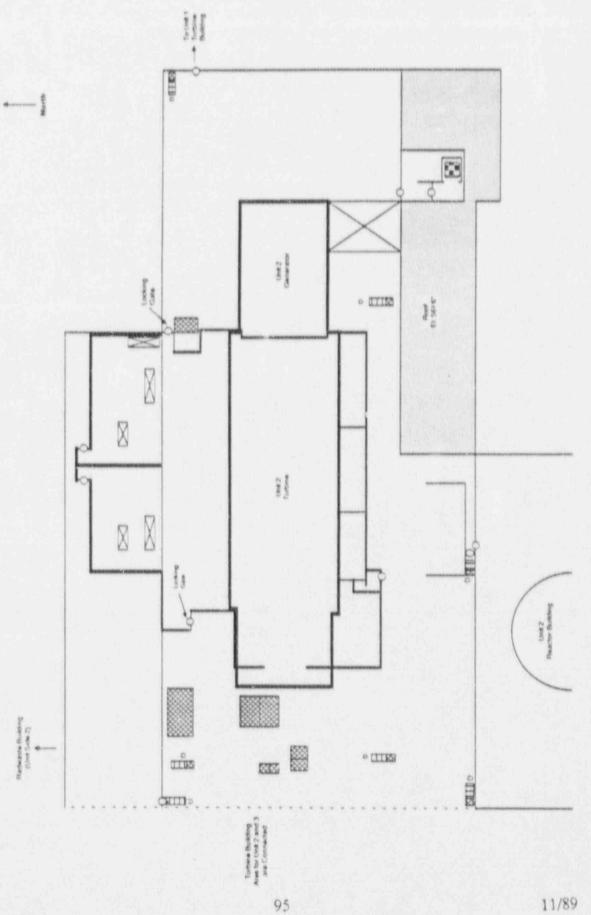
Dresden Unit 2 Turbine Building Elevation 561'-6"
